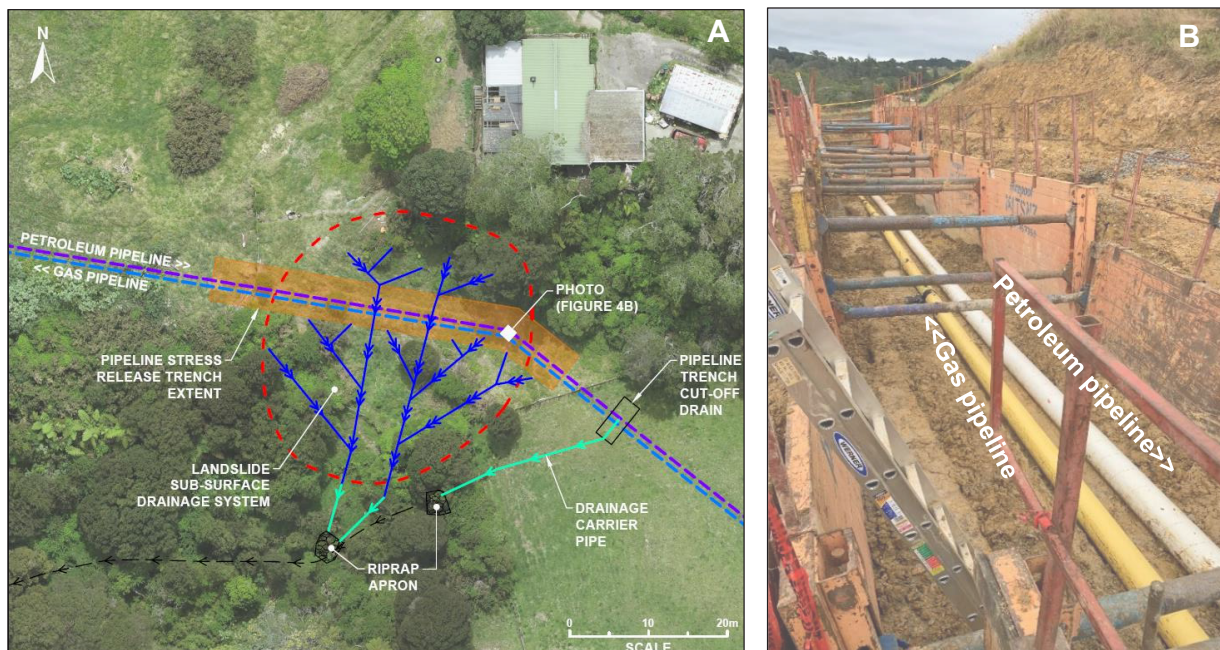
(A) Remedial works overview plan. (B) PSRT during Phase 4 (Stage 2) works. Photo facing west.
